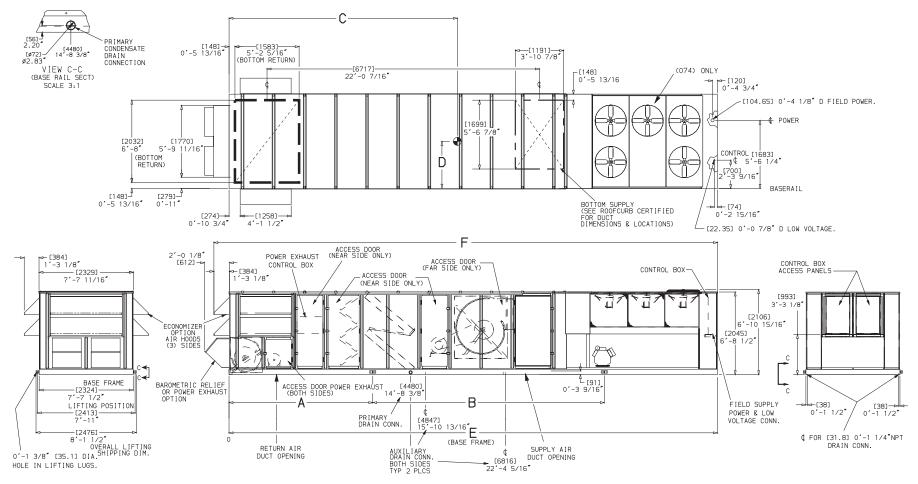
Fig. C — Base Unit Dimensions — 50FJX,FJY,FKX,FKY,FPX,FPY054-074 Units
